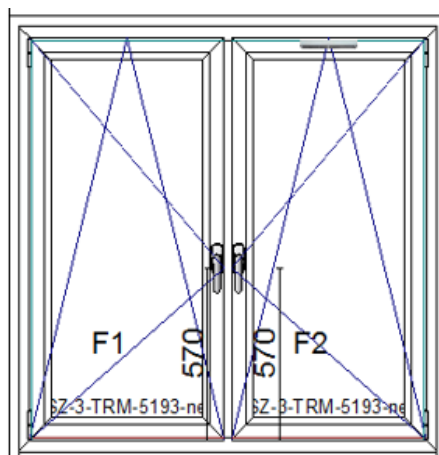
Technical drawing of a reference PVC windows (dimension 1400x1500)
